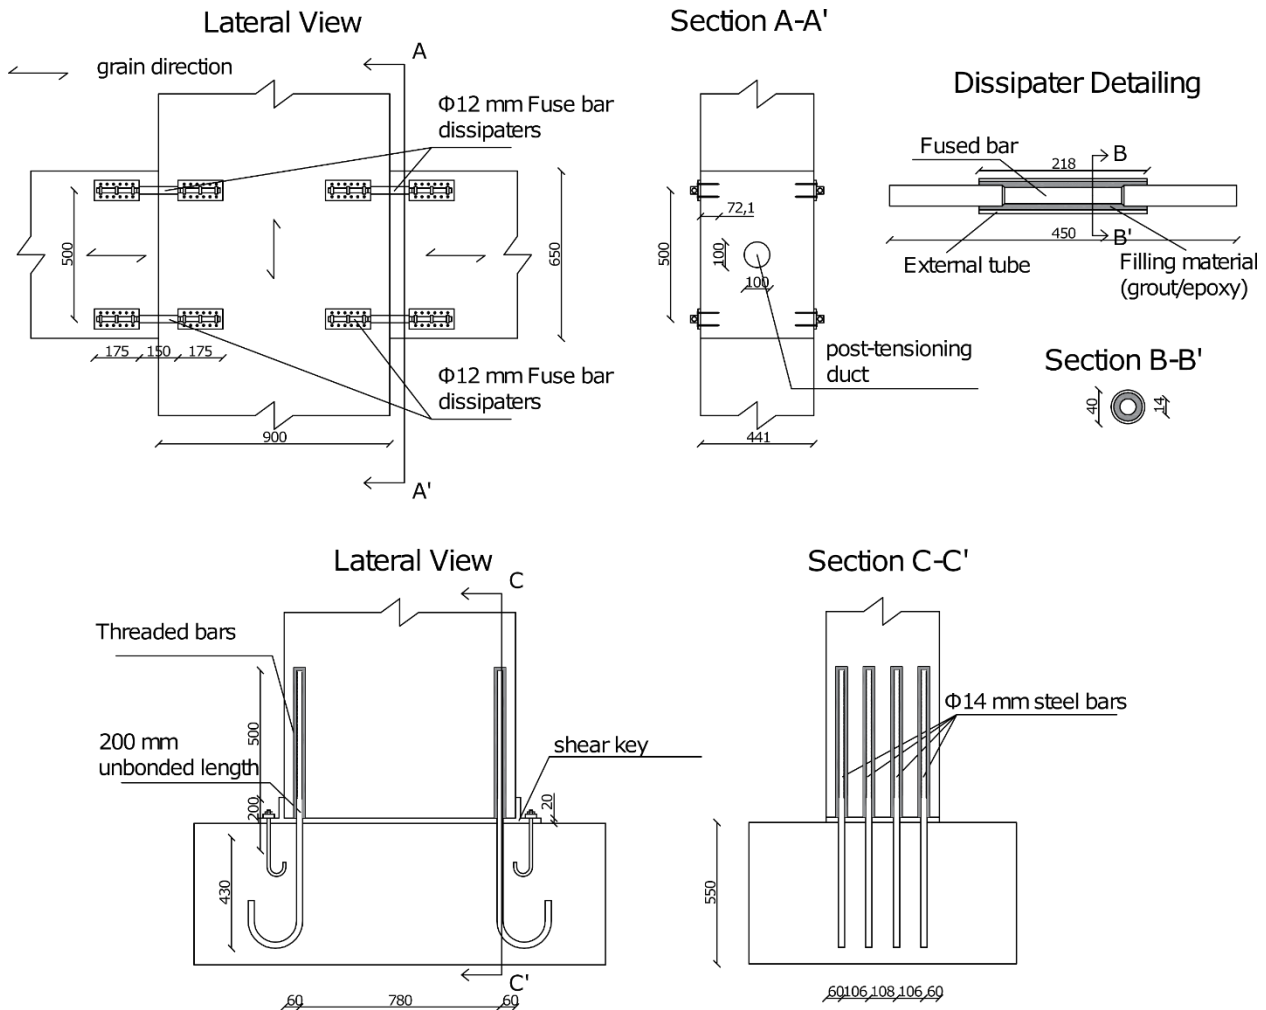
Structural detailing: beam-column hybrid joint, column-base joint and fuse dissipater.
